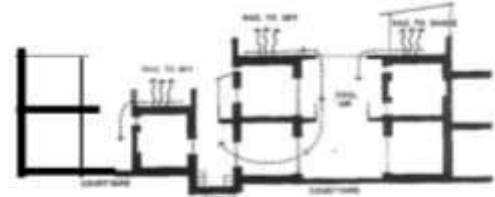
Shahjahanabad House's typical section. Parapets are not constructed toward the courtyard in order to facilitate the passage of cold air into the house. (Source author)
